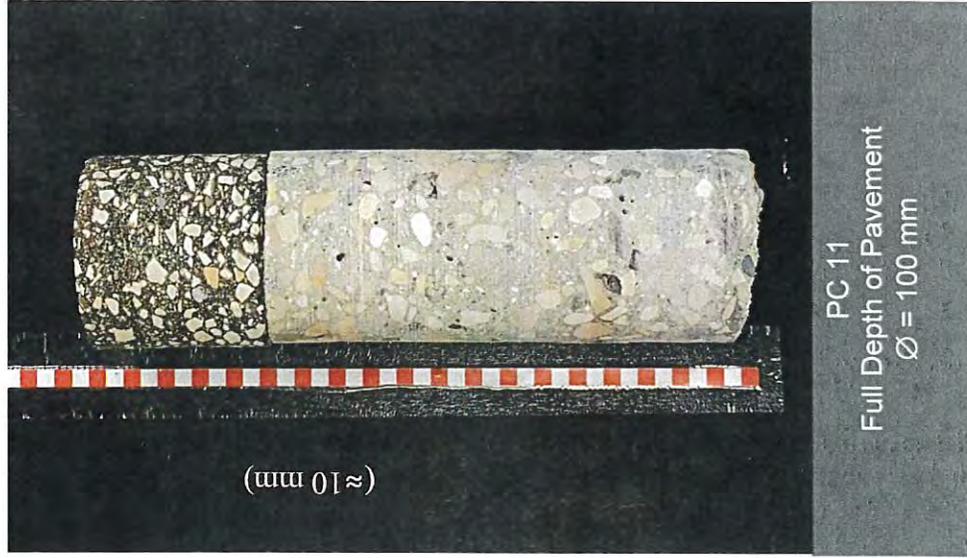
Specimen from Leila Avenue, Eastbound Curb Lane
